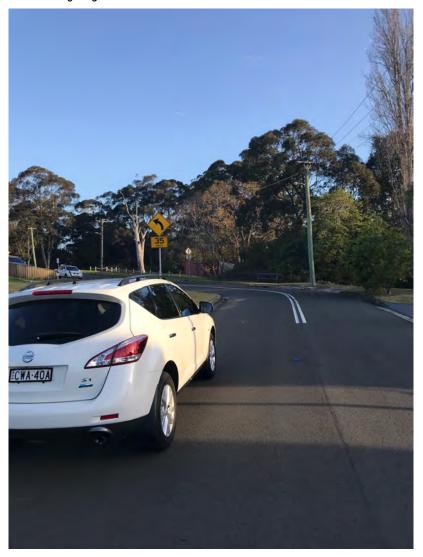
Sightlines to 39 Angel Street Driveway – Looking South
